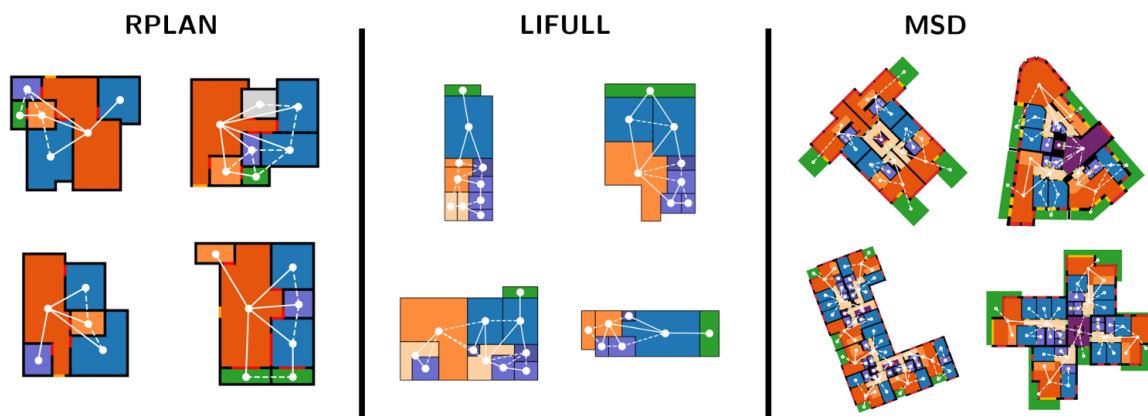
Comparison between floor plan layout datasets (Van Engelenburg et al. 2024)
